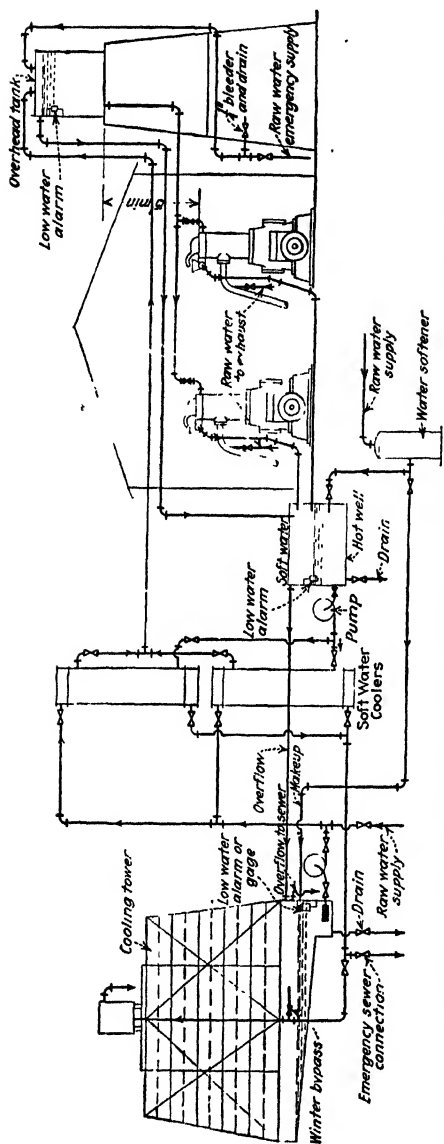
Cooling-water system using raw-water cooling tower and shell-type heat exchangers.
